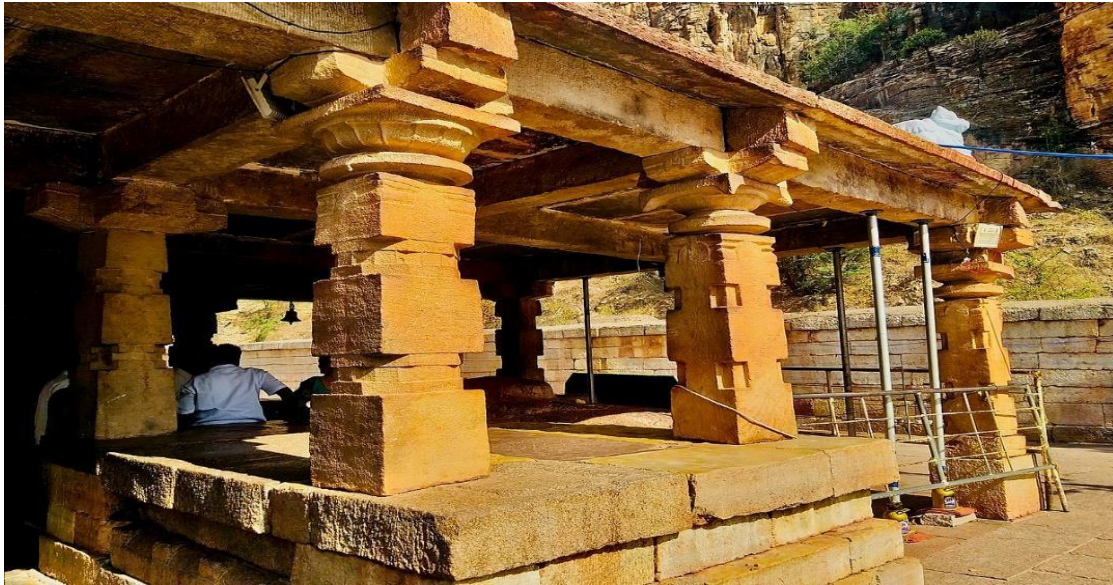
The posts and the beams of the temples are examples of prefabricated (Source: [wikimedia.org](https://www.wikimedia.org))
